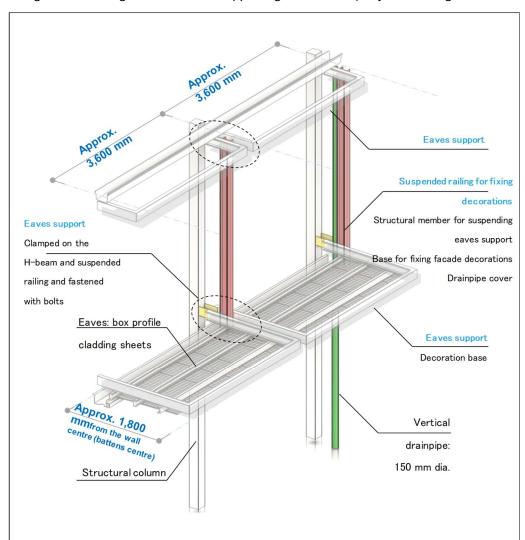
Underground frame for supporting decorations (subject to change in the future)
